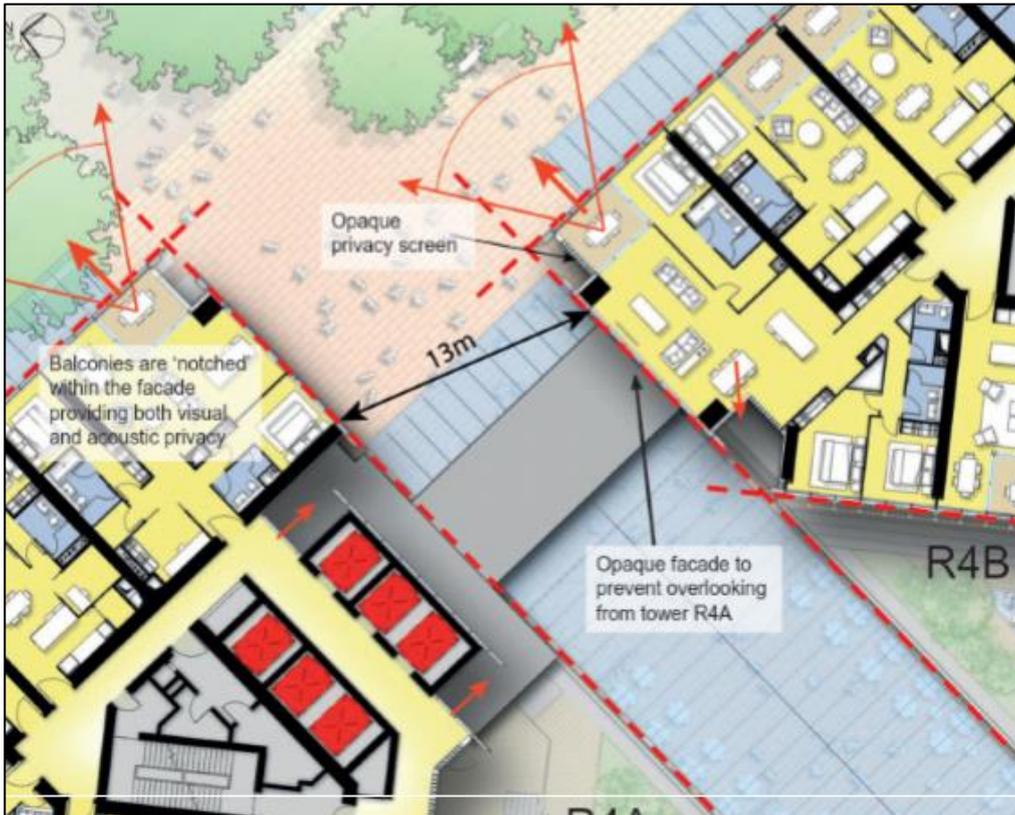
Separation between R4A and R4B demonstrating orientation of views and proposed privacy mitigation design measures (Source: Design Statement)
